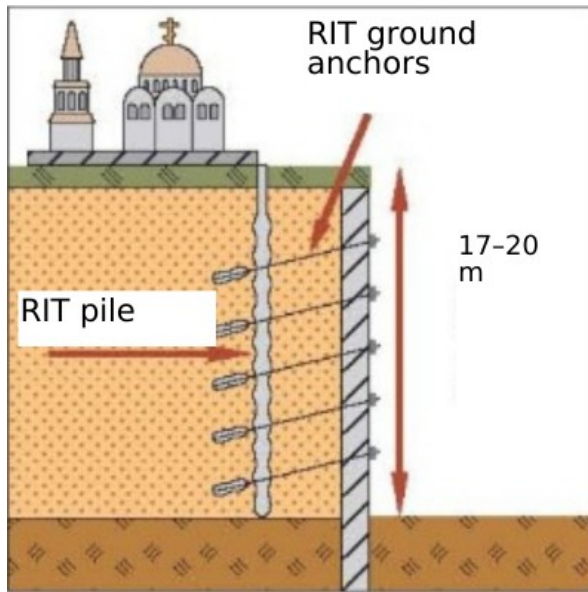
Excavation wall support using RIT piles and ground anchors at depths of 17–20 m.
